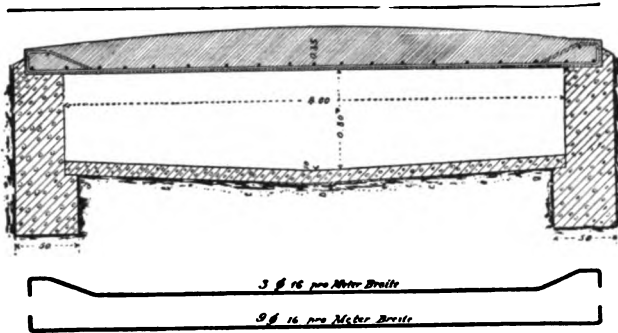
Laufbach Bridge in Laupheim. Cross-section.
